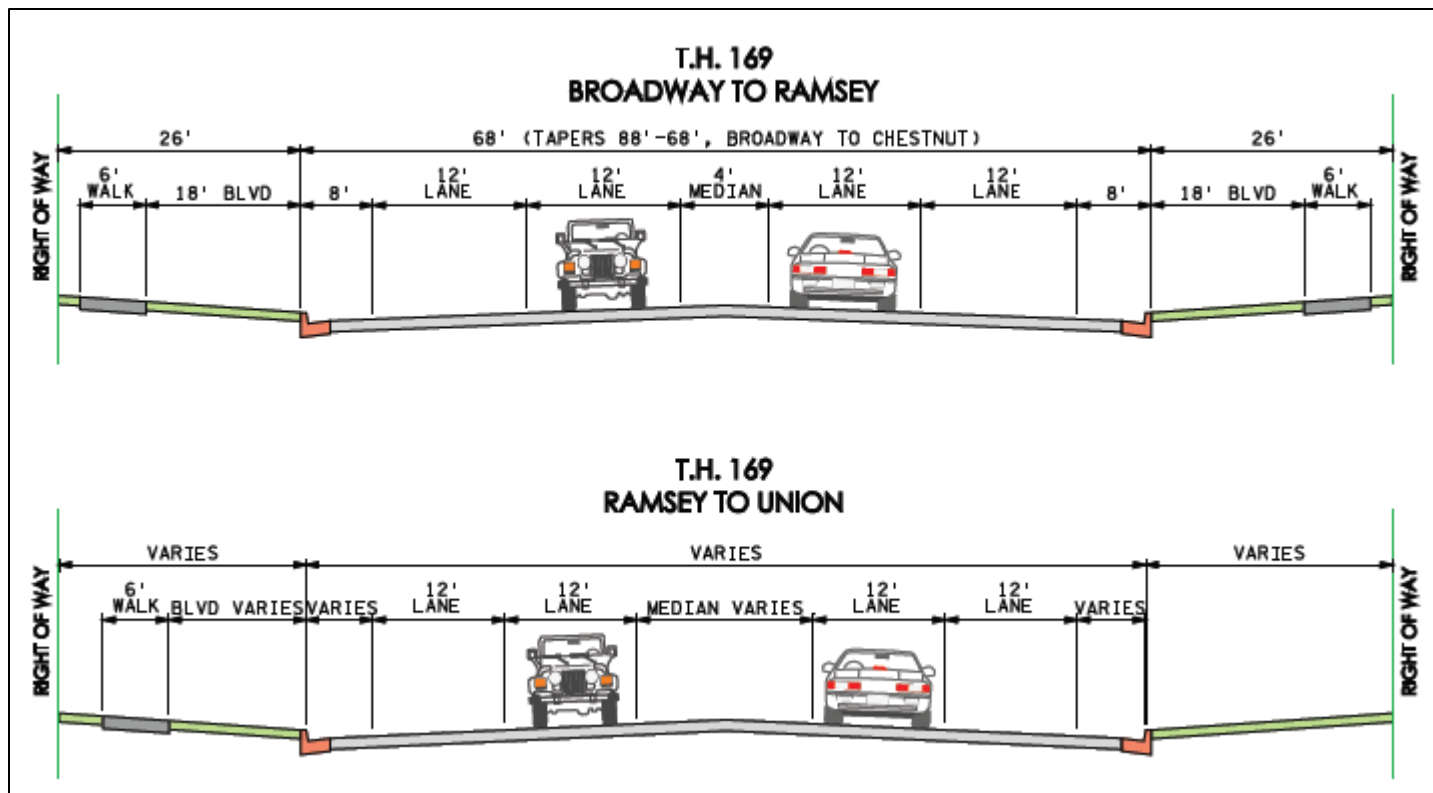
TH 169 Cross-Sections from Broadway to Union Before Reconstruction
